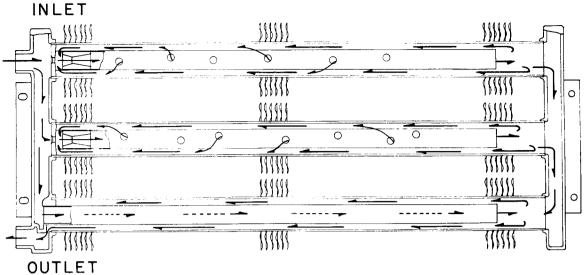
Sectioned view of three tubes of an Overhead Radiator with size of tubes exaggerated to show the flow of steam
